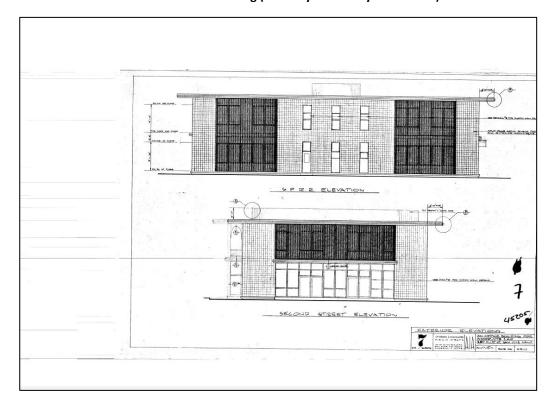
S.P.R.R (north elevation) and 2nd Street elevation drawings by Conrad H. Stieber of the 1964 commercial building (courtesy of the City of San Jose).
